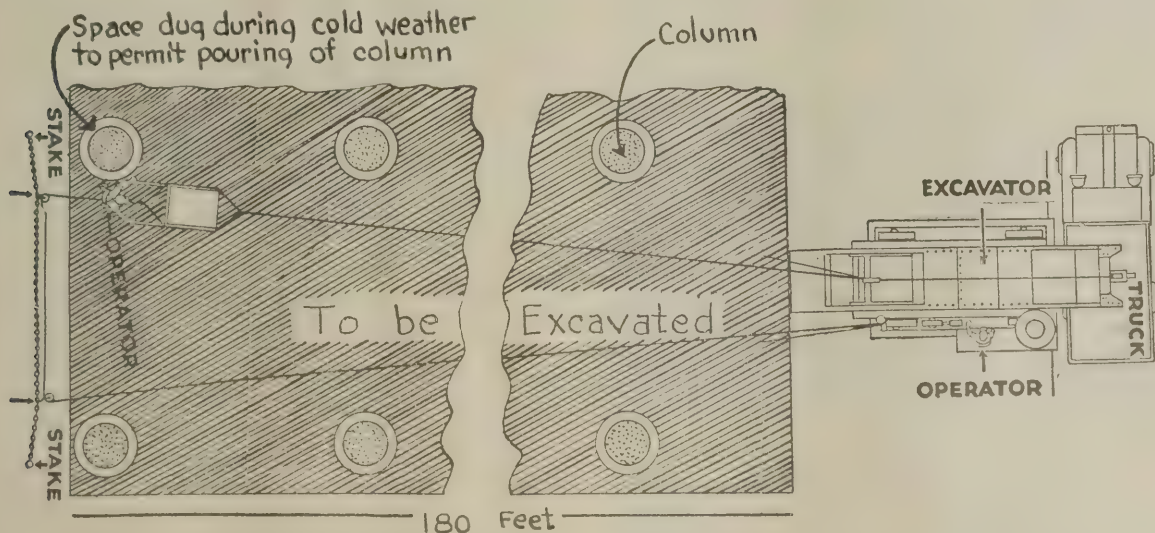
Diagram showing the arrangement of the apparatus used in excavating the basement
